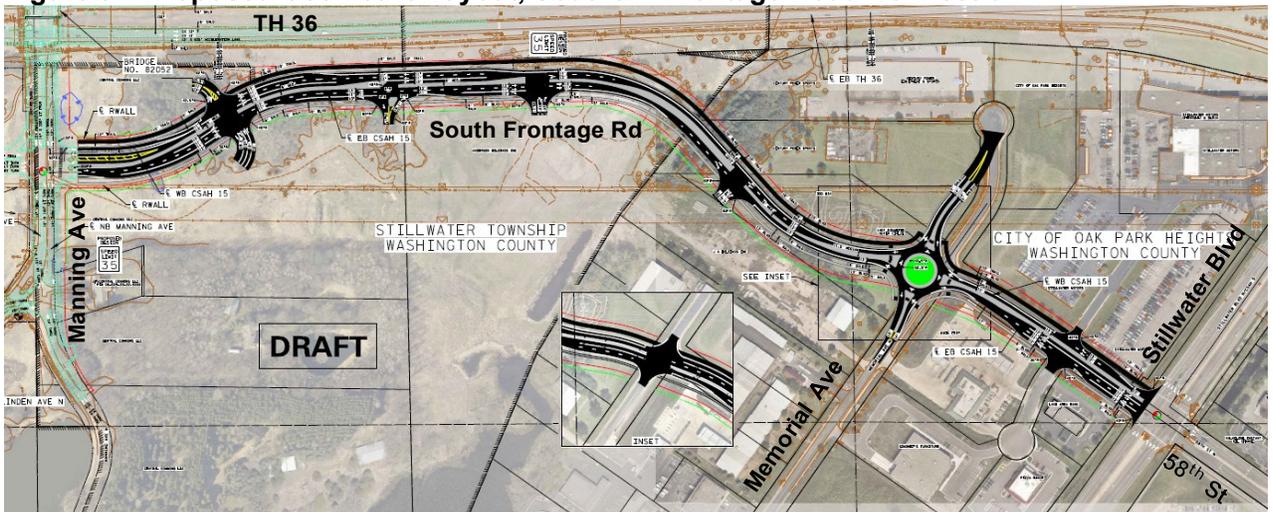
Proposed Geometric Layout, Southern Frontage Road Connection
